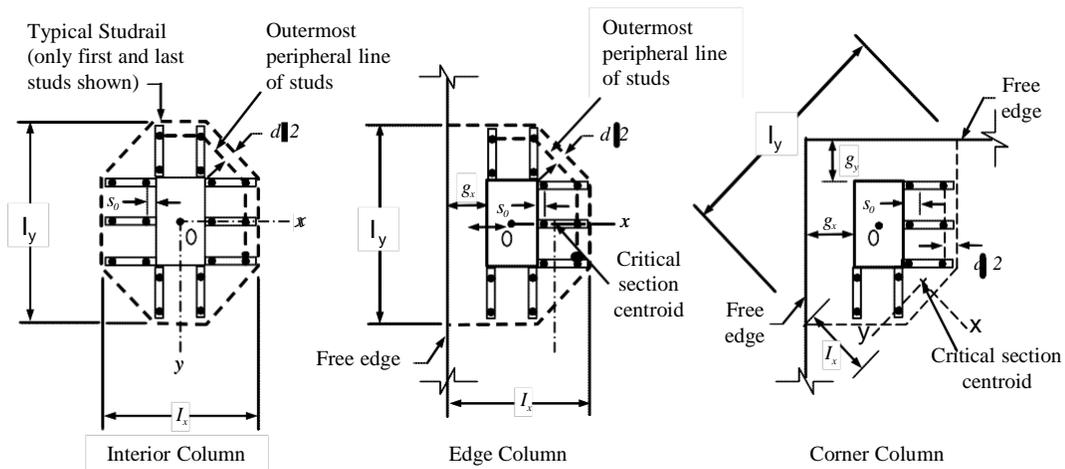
Typical arrangement of shear studs and critical sections outside shear-reinforced zone
